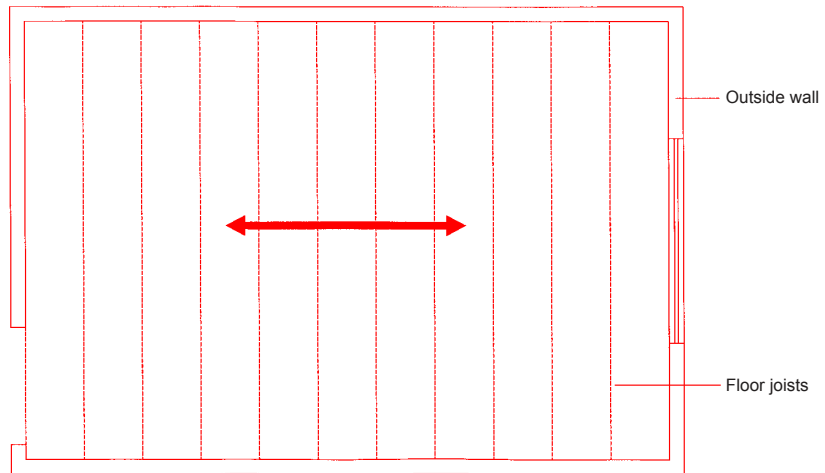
For tile, parquet and linoleum finished floors, install Quik Trak panels perpendicular to the floor joists. This will add strength to the floor and help prevent deflection of the floor.
